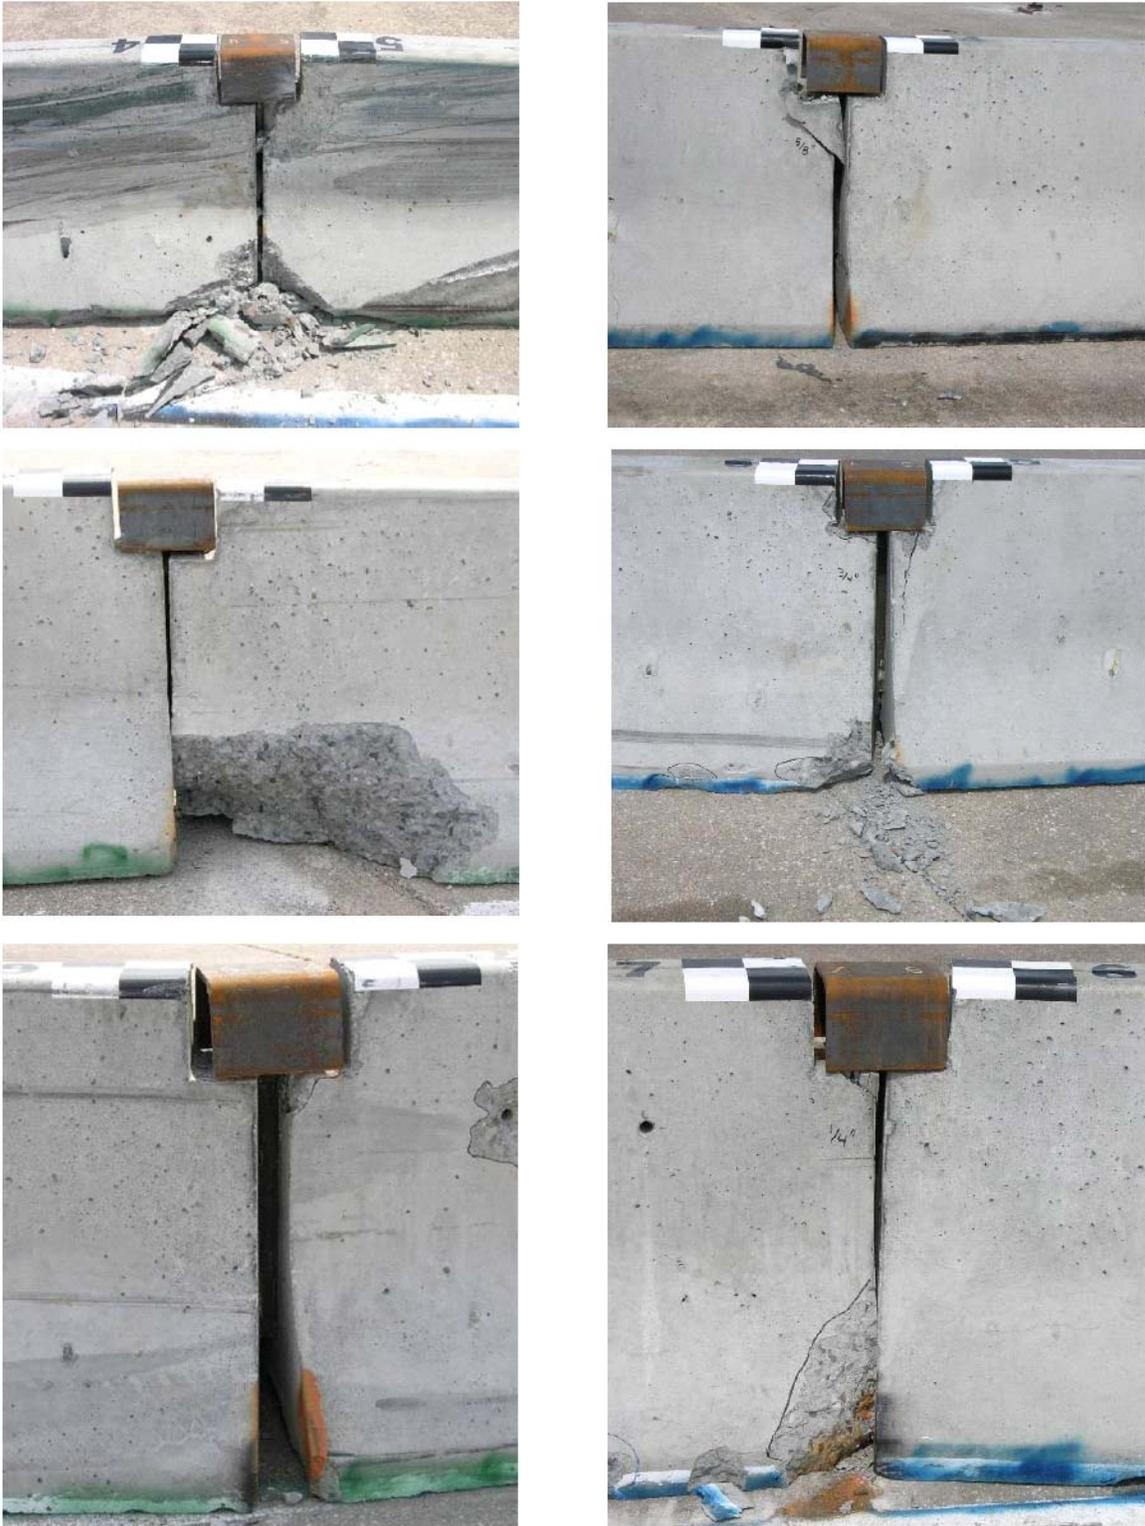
Joint Connection Damage for Joints 4-5, 5-6, and 6-7, Test NYTCB-2
